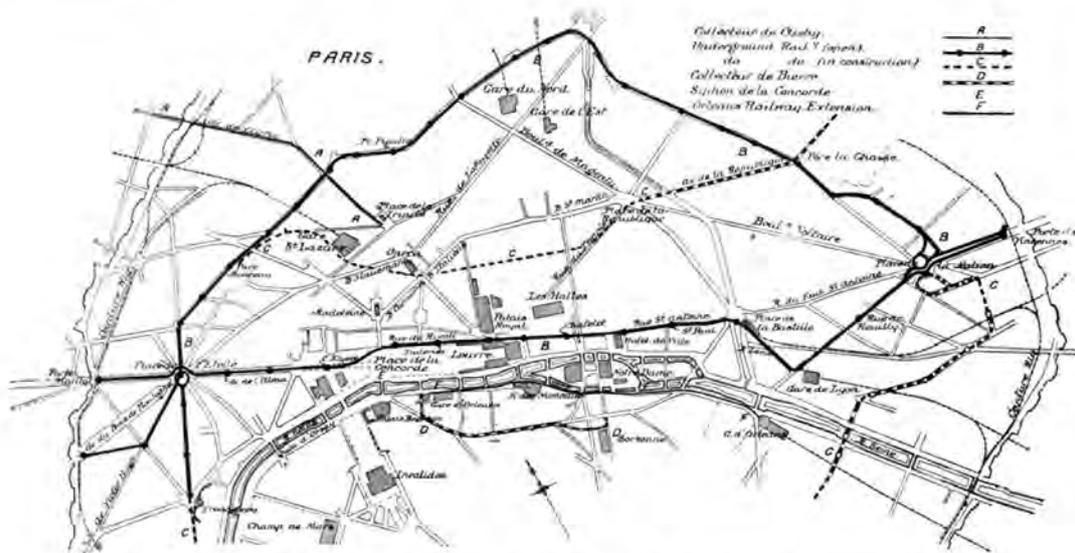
PLAN OF PARIS SHOWING POSITION OF TUNNELS BUILT UNDER SHIELD.
